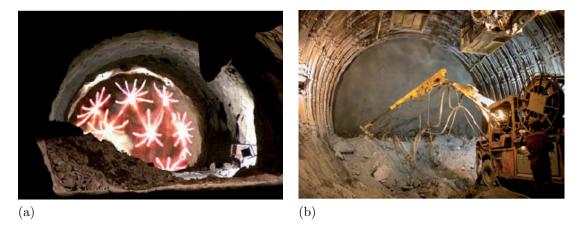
Example of conventional tunnelling processes; a) blasting and b) face support with shotcrete (ITA 2009).
